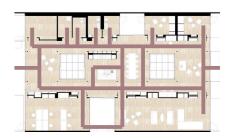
Movement Plan by : Reich and Hall architechts Lines added by Author
